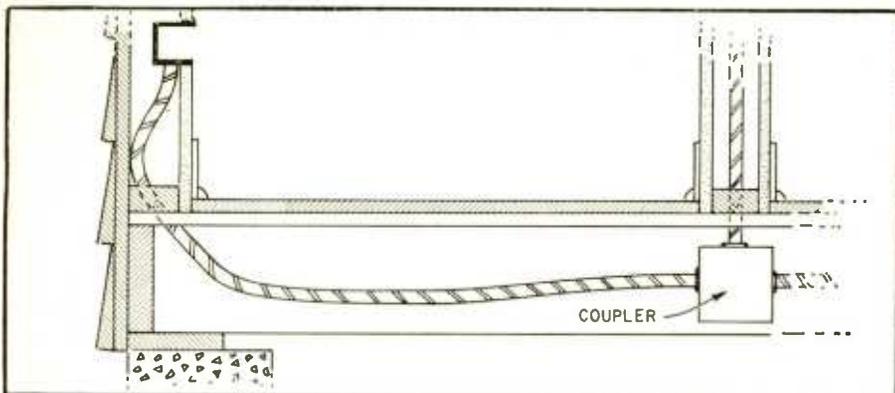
Often you can make a neat job by routing cable between basement rafters (in other words, just below ground-floor level). Outlet boxes for the cable go in walls.
